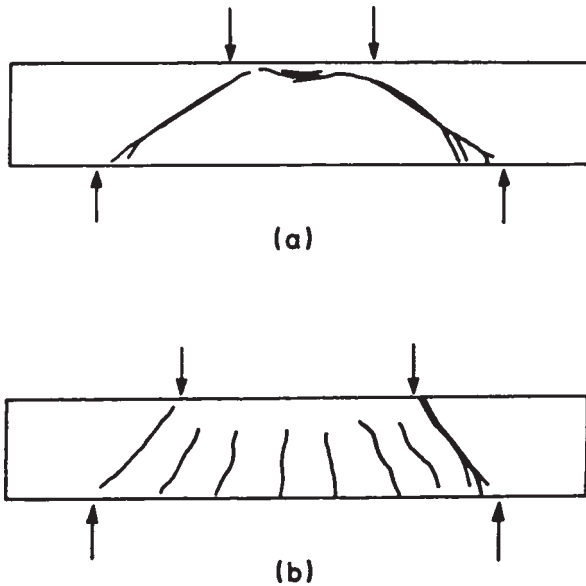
Typical modes of failure of deep beams exhibiting (a) type III, (b) type IV behaviour.
